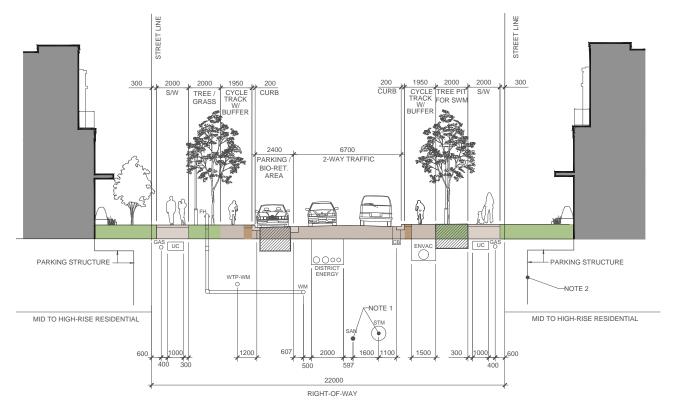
Street 'I' (New Haig) 22.0m R.O.W.
